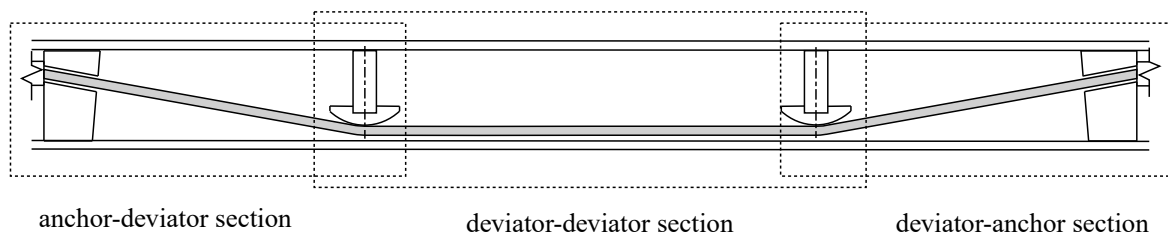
An external prestressed tendon setup in a box-girder bridge.
